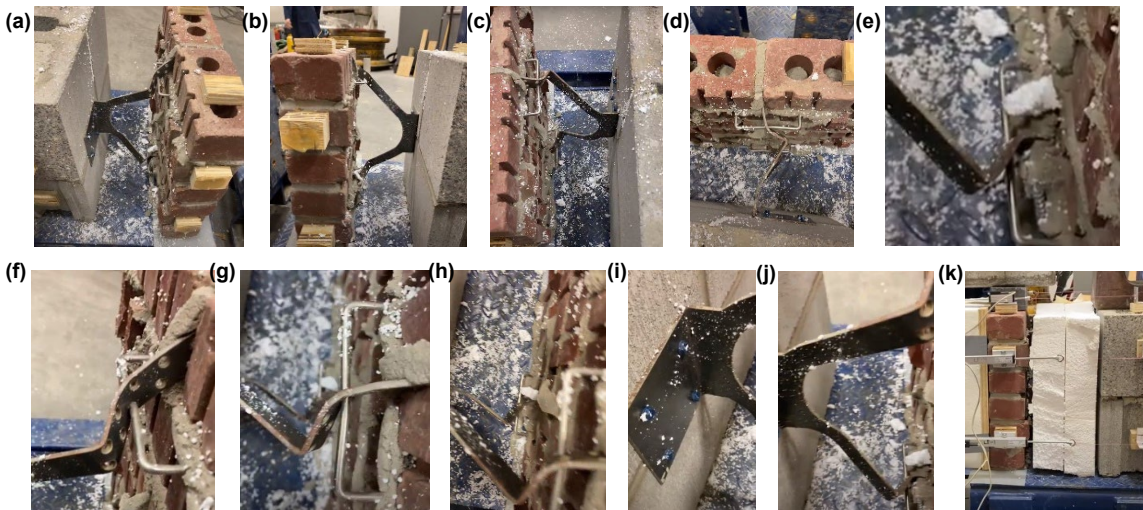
C-INC.CL-1 after testing of (a) side view, (b) alternative side view, (c) elevated view, (d) top view, (e) bottom leg view, (f) top leg side view, (g) top leg top view, (h) both legs top view, (i) CMU connector Tapcon fastener interface, (j) connector mid location view, (k) specimen view during testing
